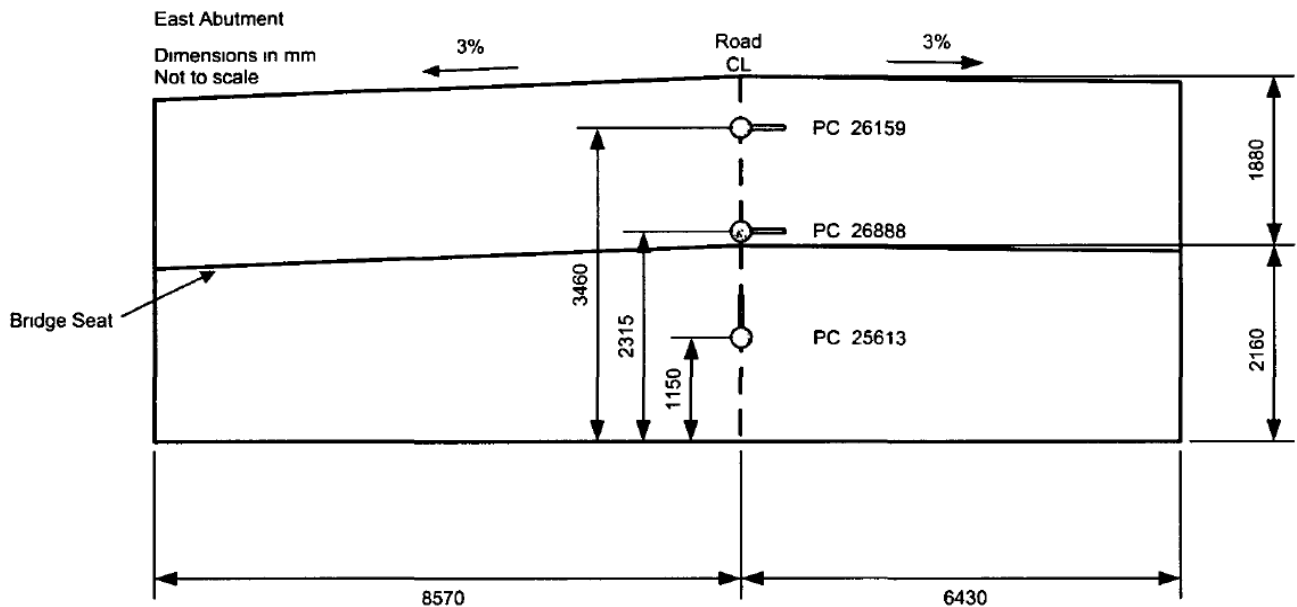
Pressure cell locations on the east abutment. A similar configuration was used for the west abutment (Huntley, 2009).
